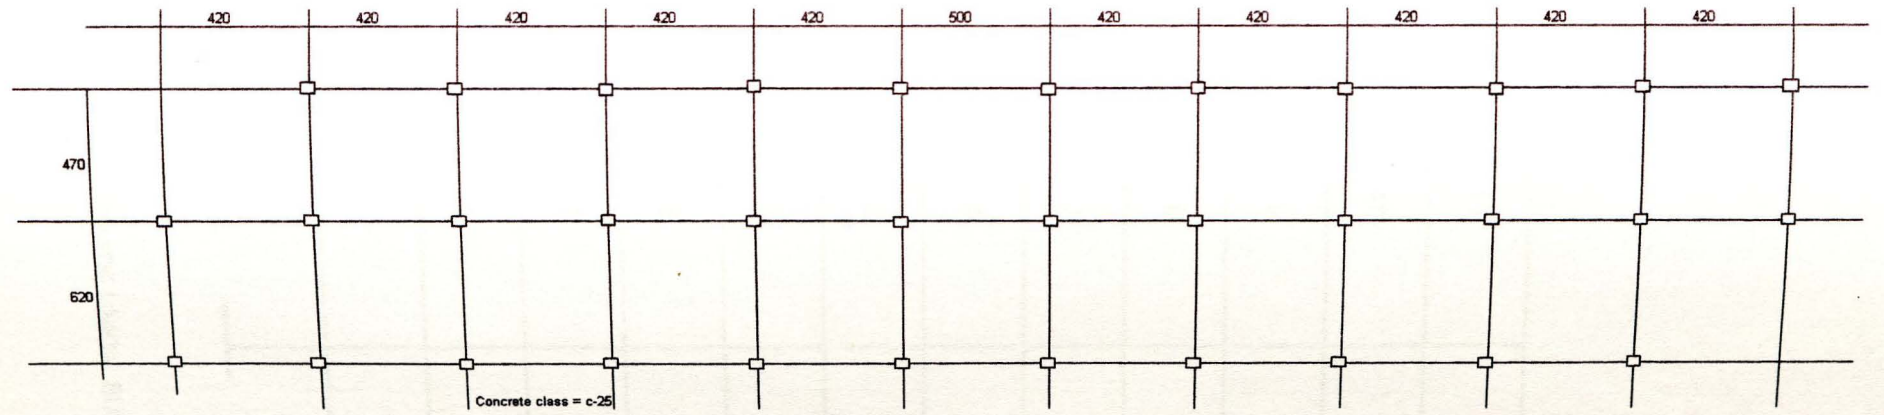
ETHIOPIAN TRADE UNION FLOOR PLAN.
